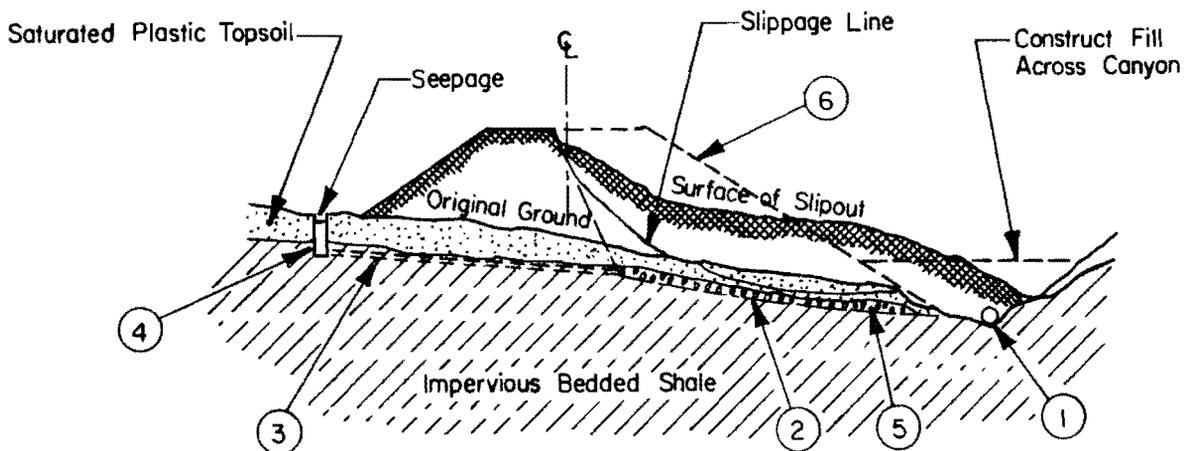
Typical cross section of stripping employed for slide prevention - Redwood Highway, California (Root, 1958).
